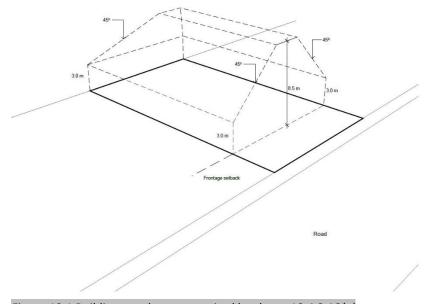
Building envelope as required by clause 10.4.2 A3(a)
